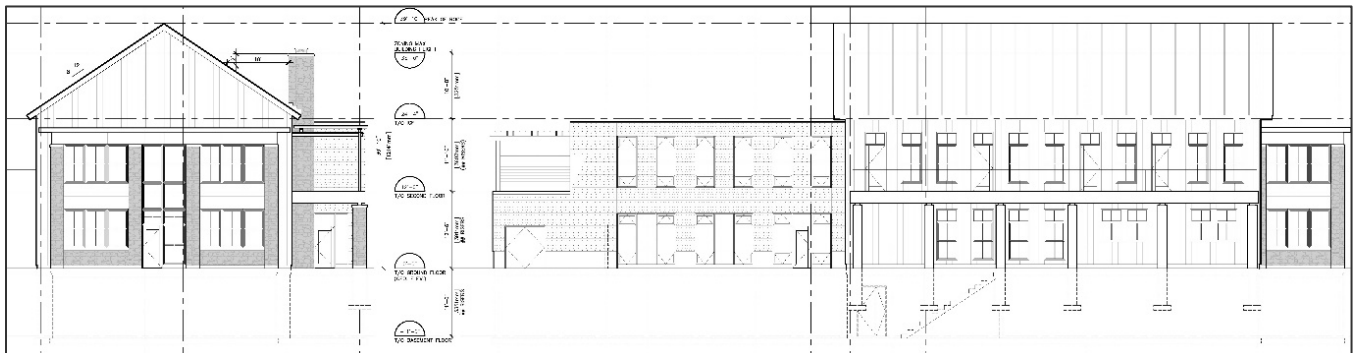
South and West Elevations, South Wing (source: Shoalts and Zaback Architects)
